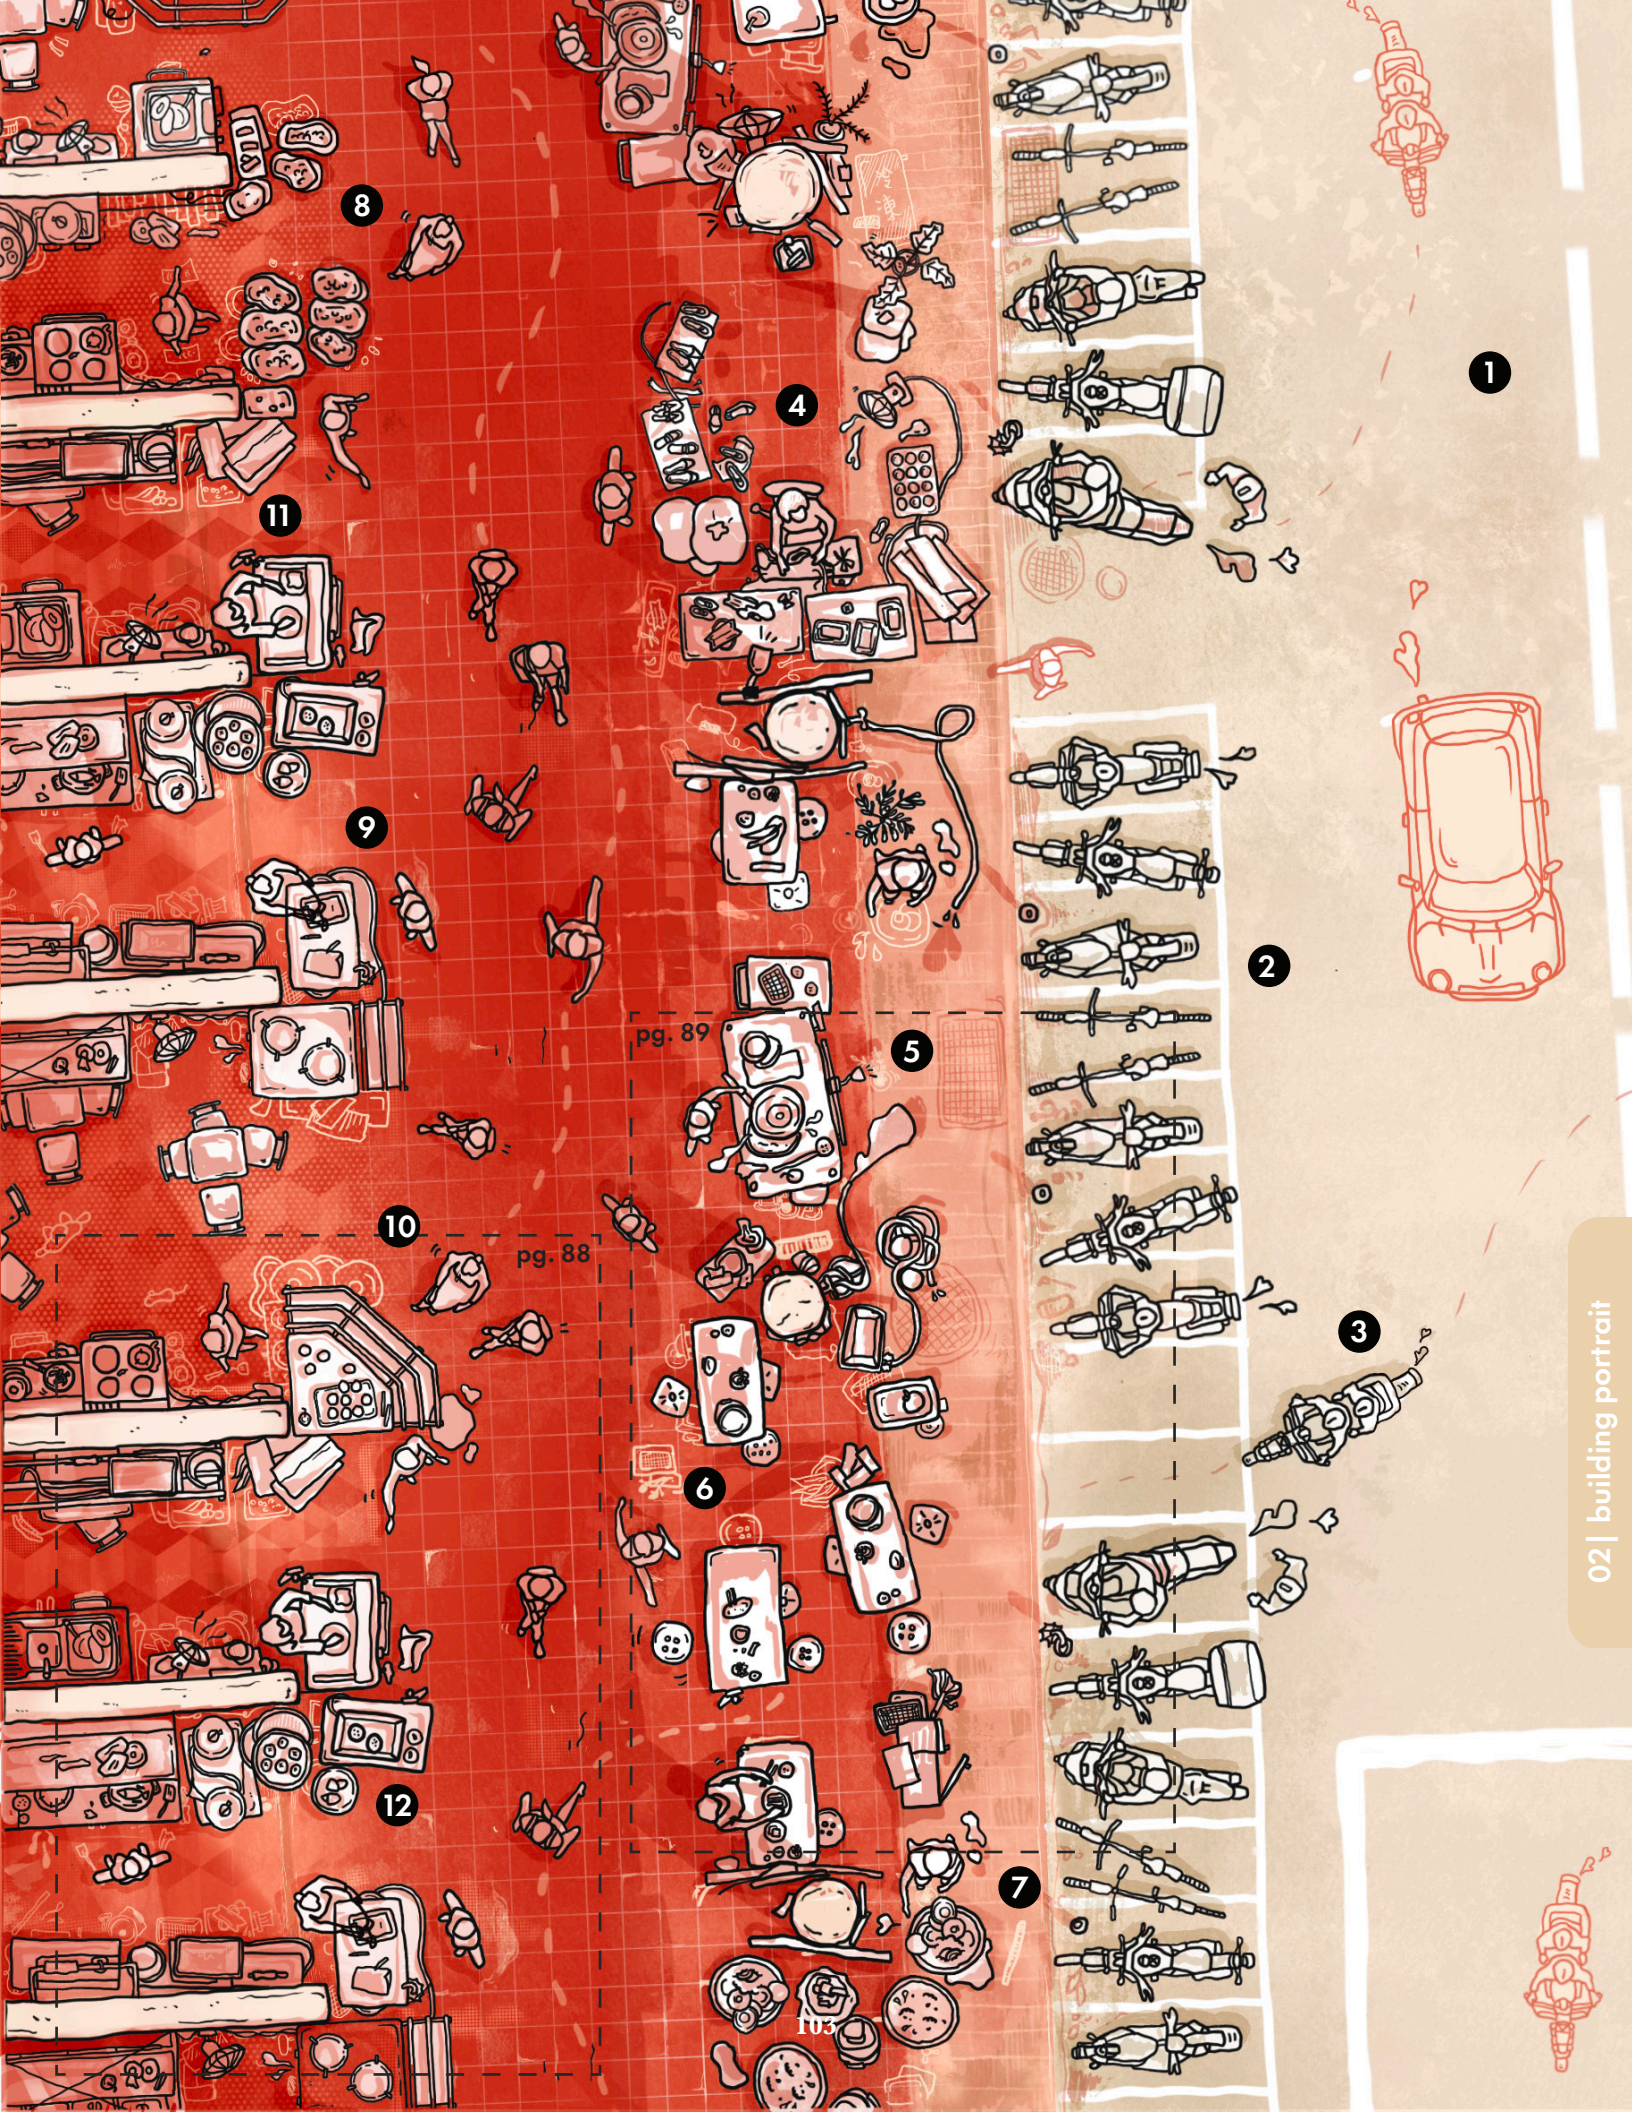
The plan of the Xinwei Building's ground floor arcade along the Da'an Rd.
